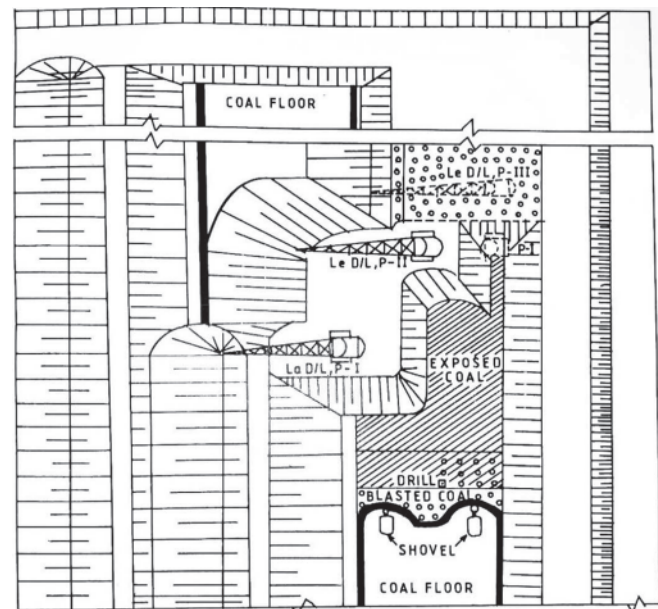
Plan of mining system in horizontal tandem (N. Kishore, Ph.D. Thesis, 2004)
